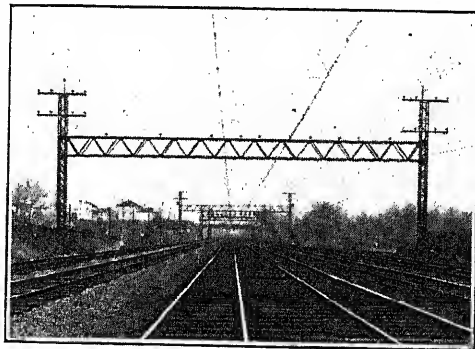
ORIGINAL "WOODLAWN-STAMFORD" TYPE DOUBLE CATENARY INSTALLED IN 1906 OVER FOUR NEW HAVEN MAIN TRACKS AT RIGHT, WITH NEW SINGLE CATENARY INSTALLED 1925 OVER TWO "WESTCHESTER" TRACKS AT LEFT
